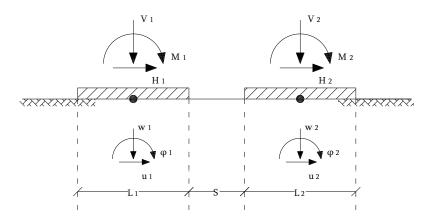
Adjacent strip foundations bonded to an elastic half-space.
